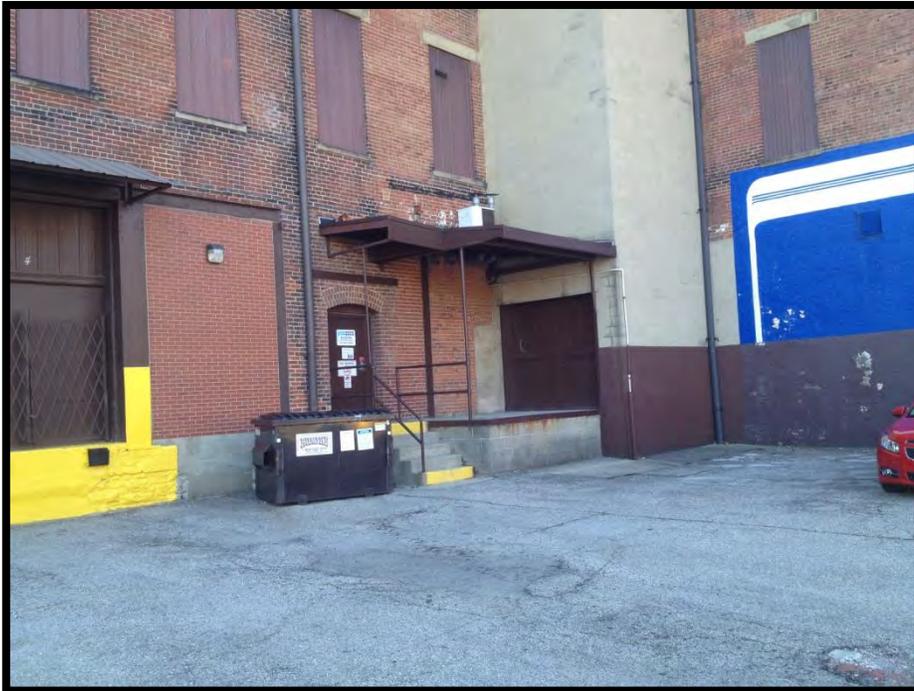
View of northwest corner of building at 2201 Spring Grove Avenue.
